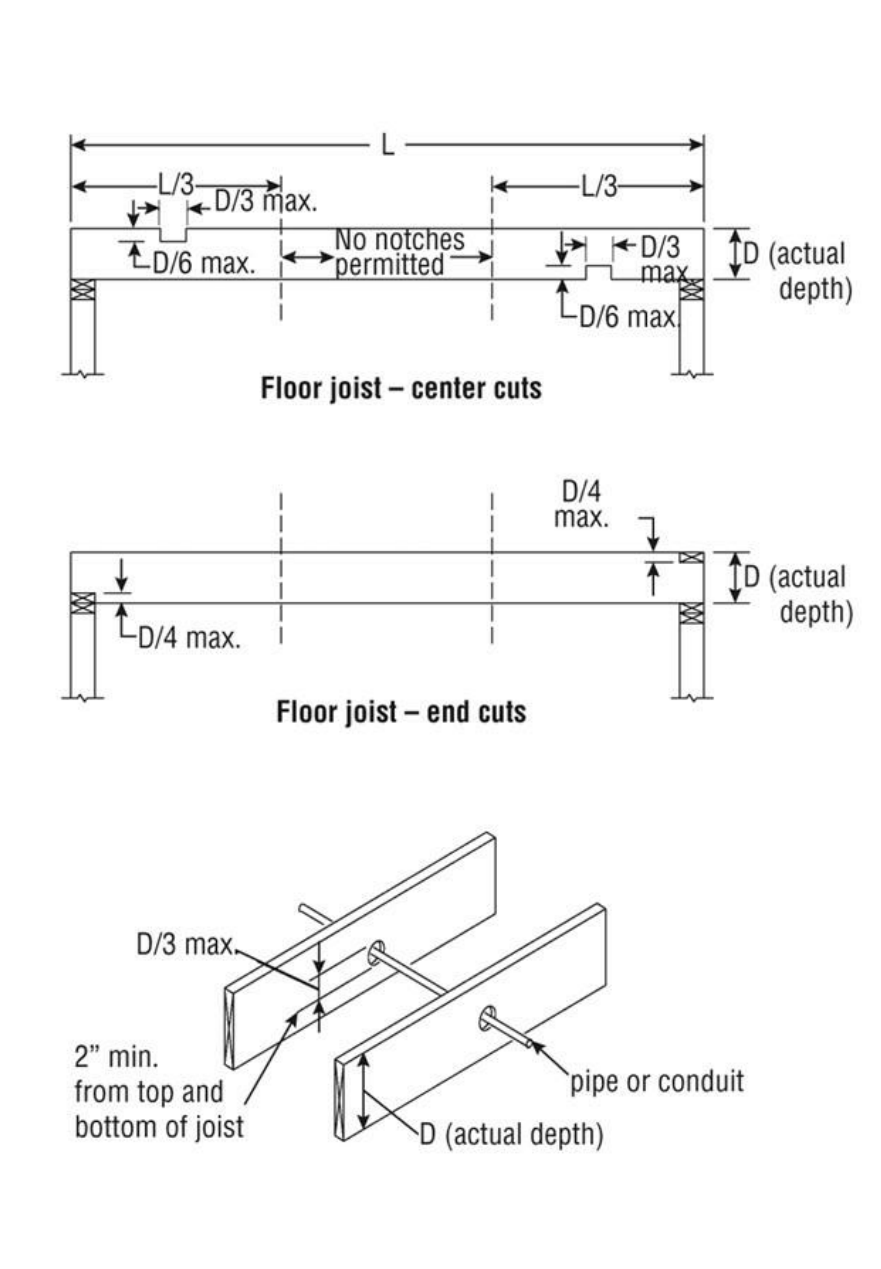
CUTTING, NOTCHING AND DRILLING
